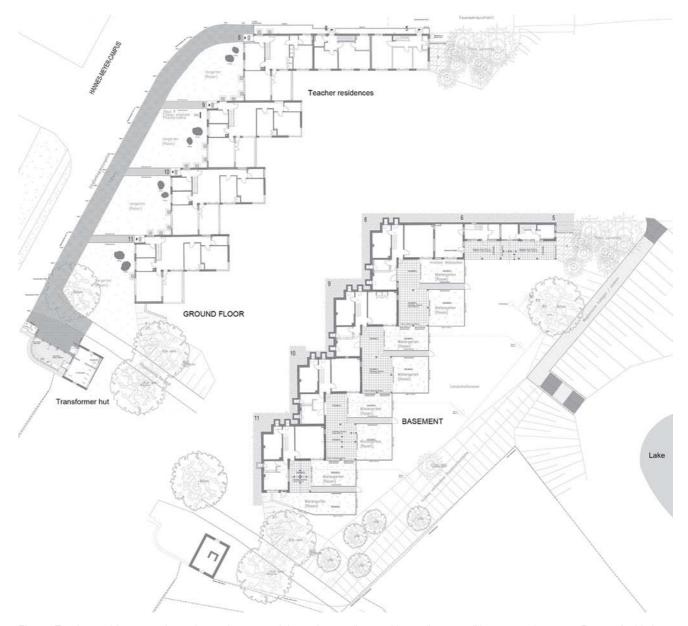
Teacher residences and transformer hut, groundplans of upper floor and lower floor, condition 2015, plan 2015, Brenne Architekten
